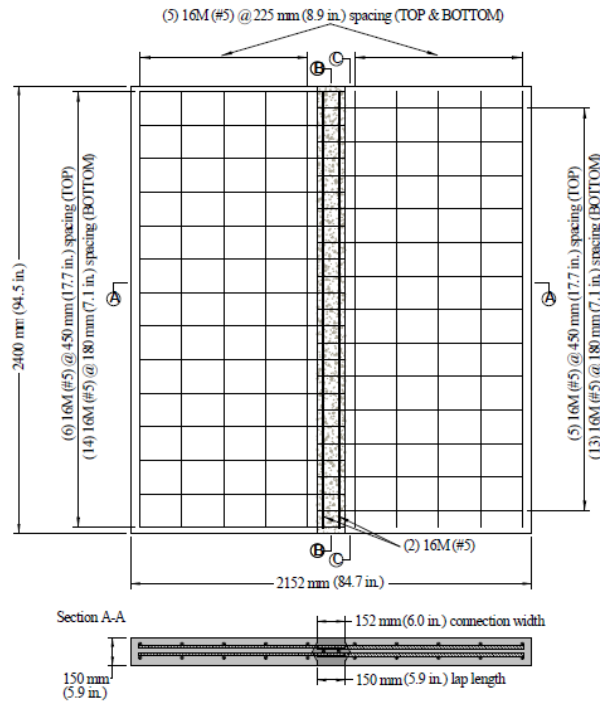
UHPC Longitudinal Joint Specimen with Straight Non-Contact Lap Splice Rebar Configuration (Graybeal, 2010)
